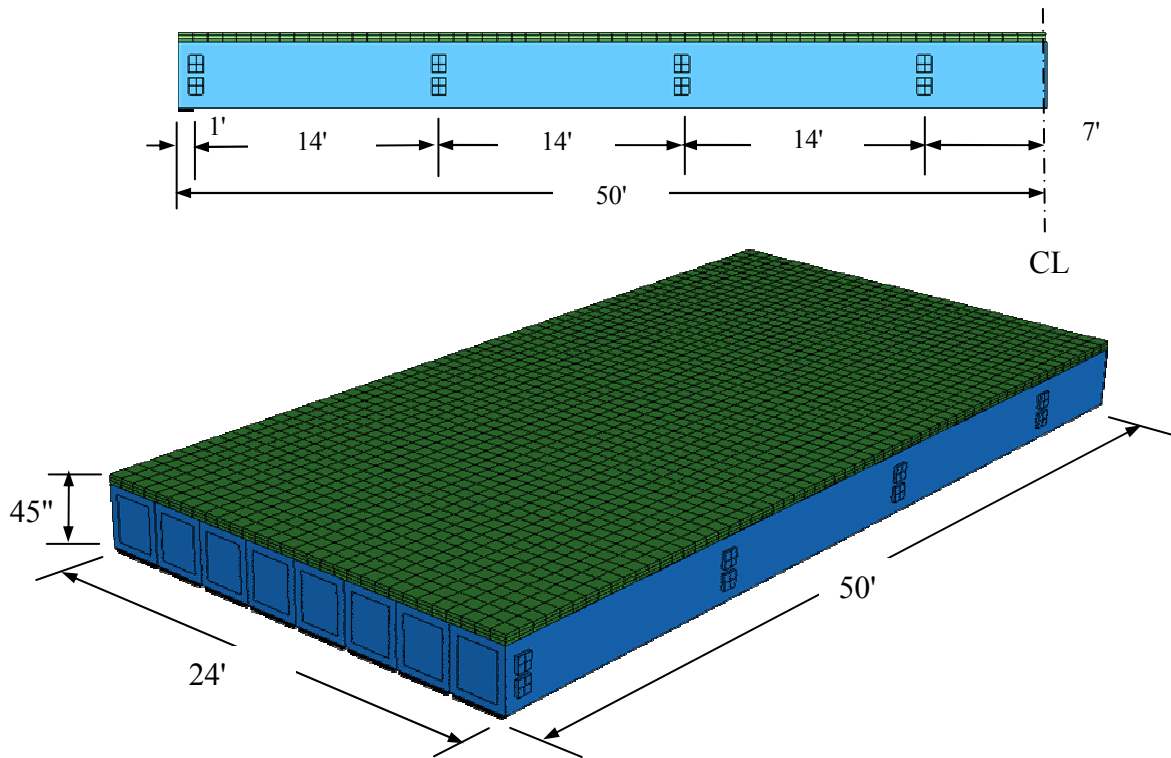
Modified assembly of 100 ft span bridge model constructed using 36 in. wide box-beams.
